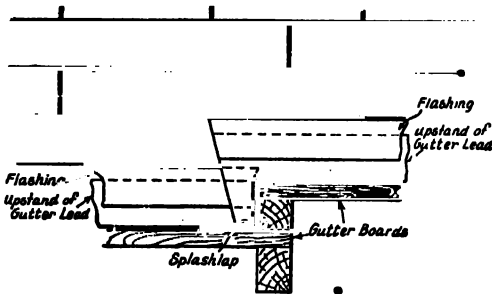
Section through parapet gutter, showing flashing to parapet or wall and drip detail (see also Figs. 6 and 7).
